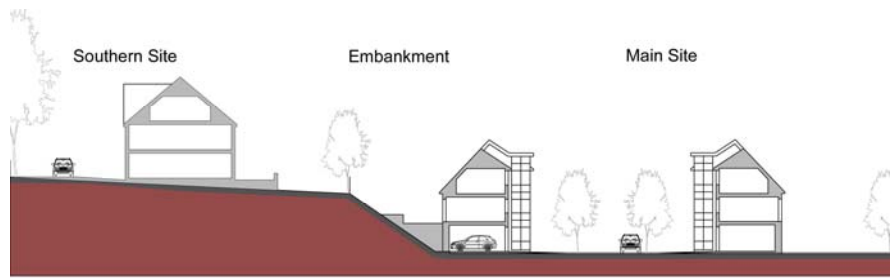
Possible utilisation of the embankment as first floor gardens and terraces
